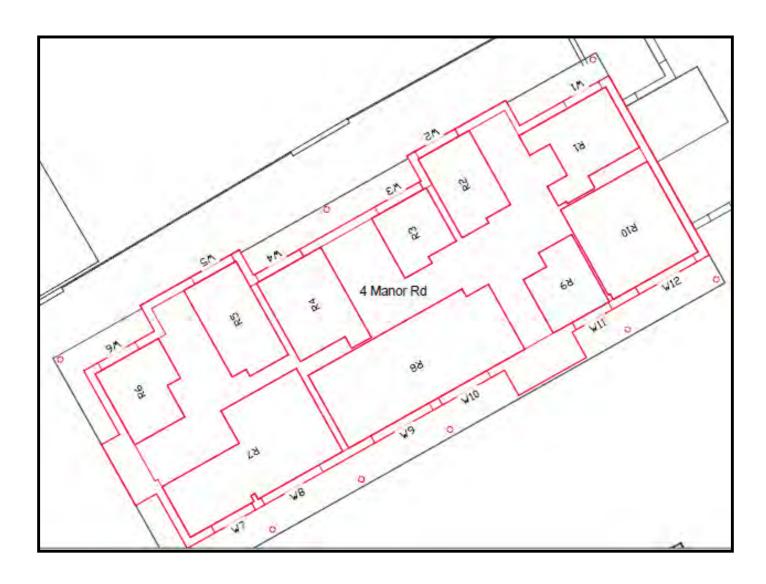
Sunlight and Daylight Assessment Location Plan at Proposed Third Floor Level at 4 Manor Road
